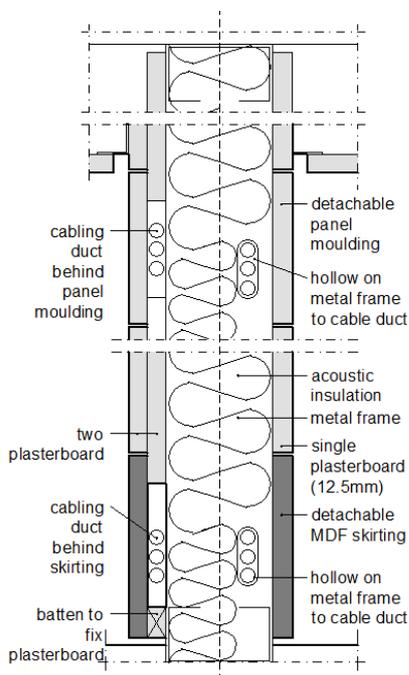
Hypothesis for laying cables in a new wall to ensure easy maintenance and upgrading
